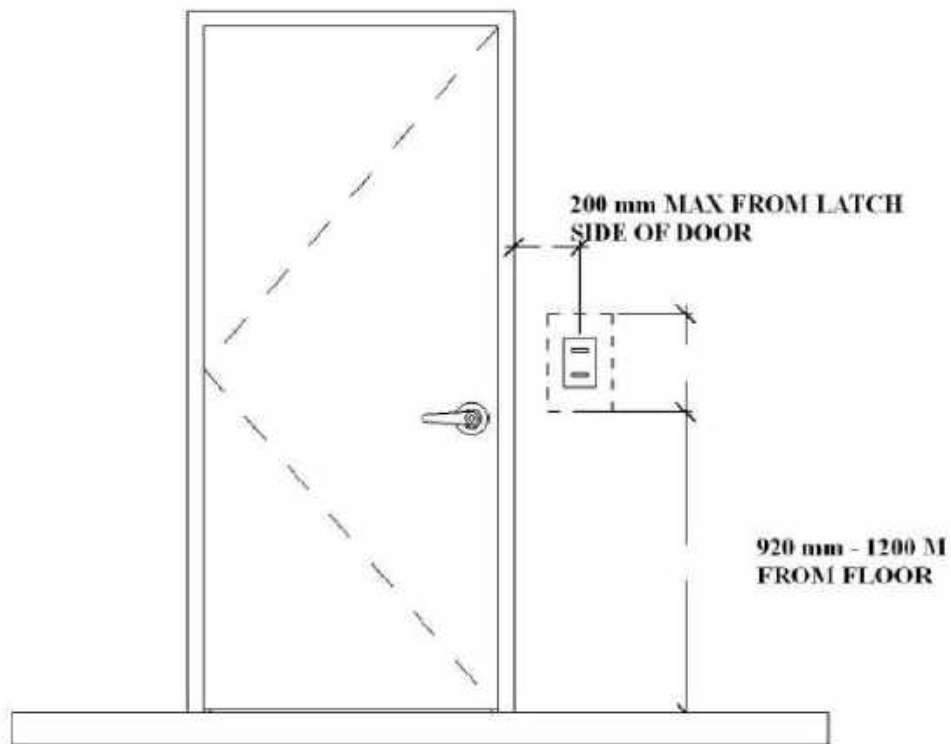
Image above shows light switches installed between 920 mm and 1.20 M from the floor and 200 mm from the jamb at the latch side of the door
